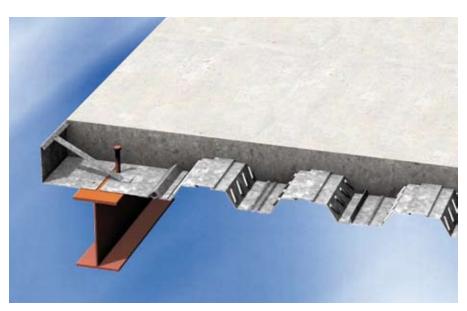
Typical composite slab and composite steel edge beams Kingspan
